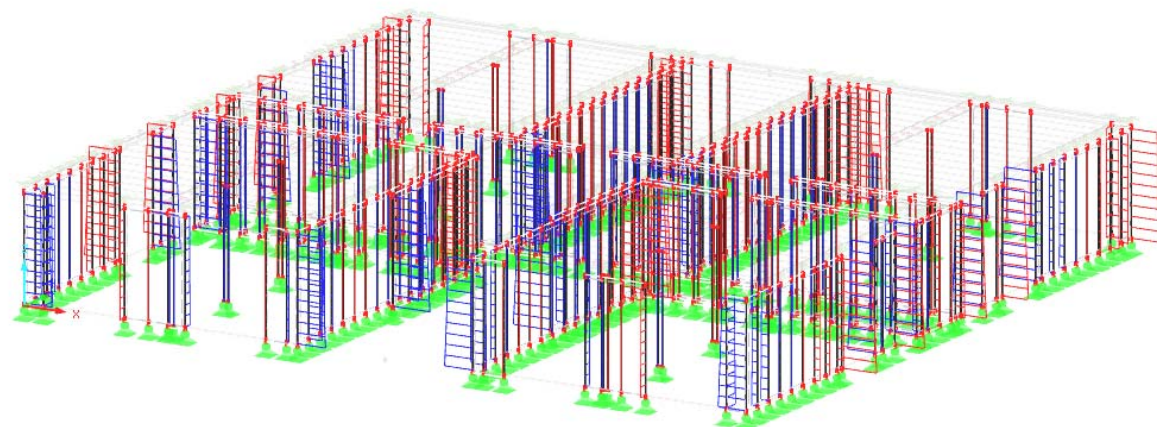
Distribution of the internal normal forces in the studs of the first storey of the panel construction for LC3 (wind from the front)
